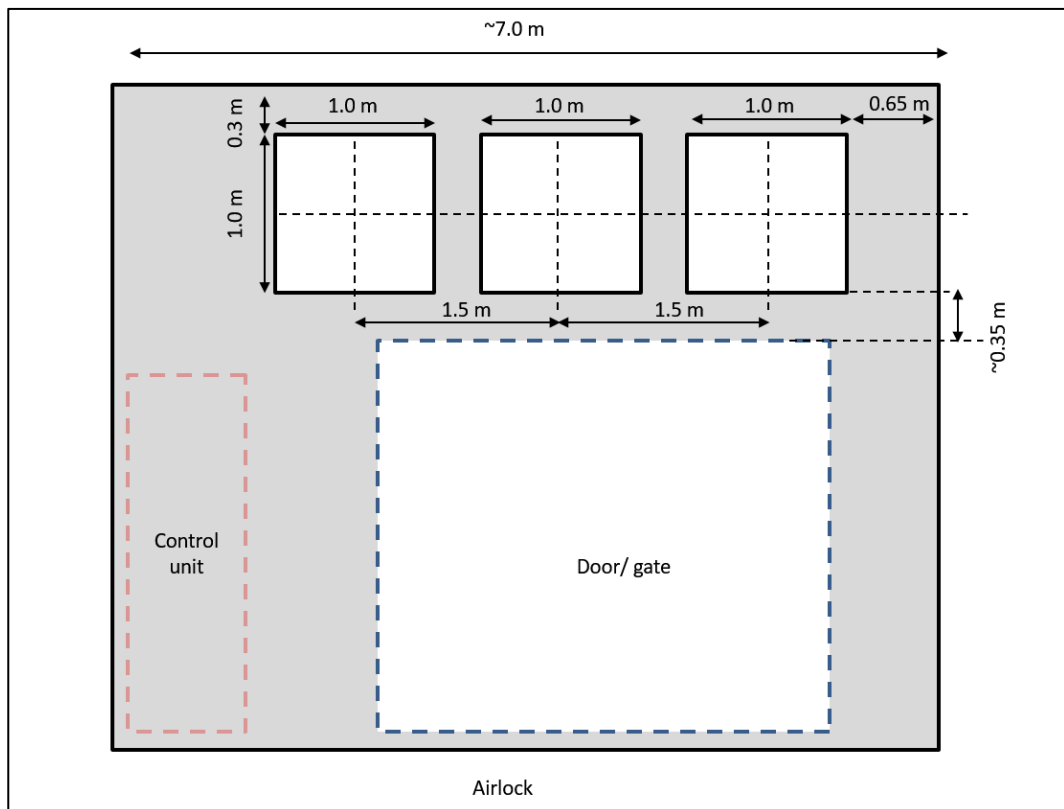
Airlock front view wall openings for ventilation equipment.
